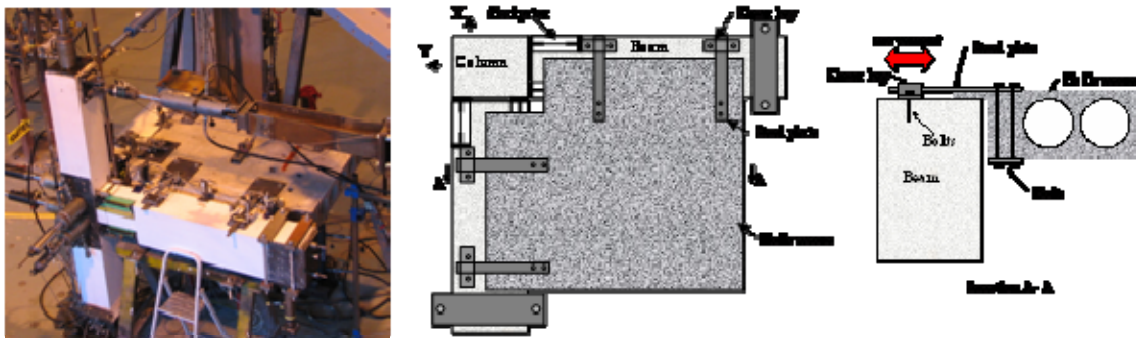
3-D beam-column joint with articulated floor unit. Overall view, concept and connection details
